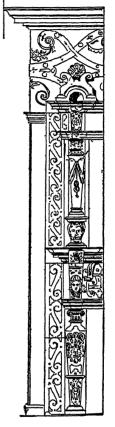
Detail, Chimneypiece in Aston Hall.
